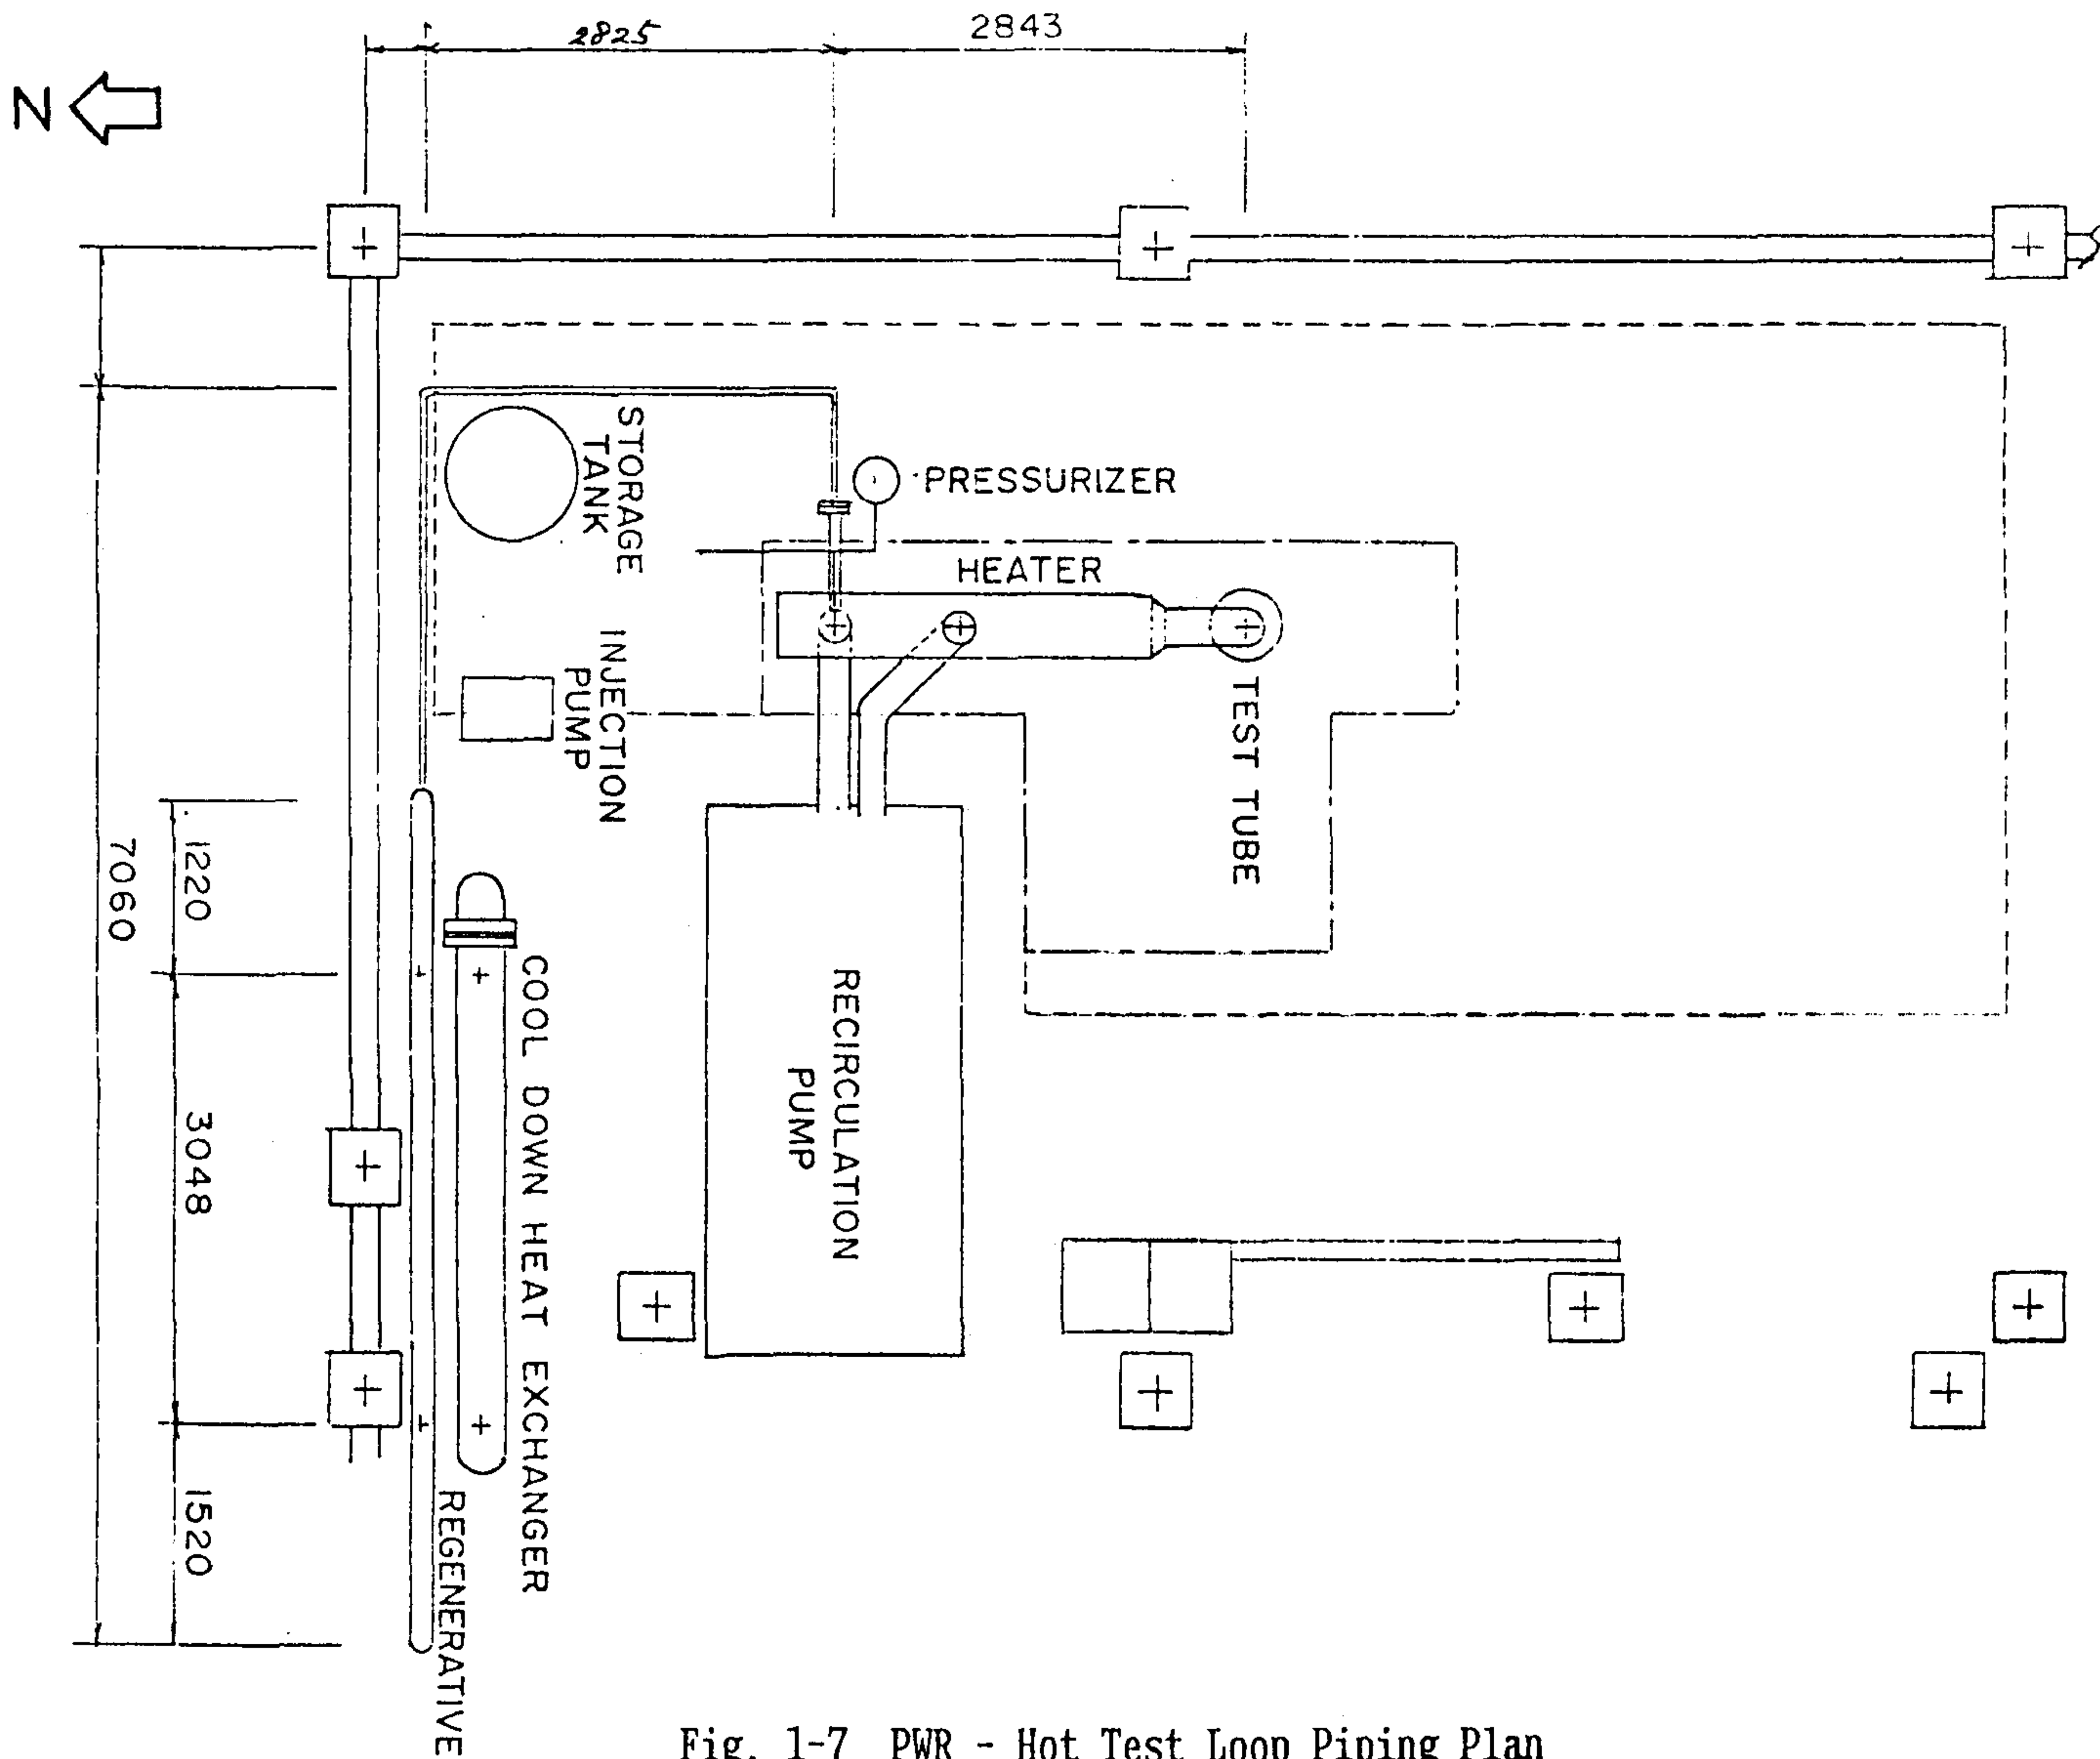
PWR - Hot Test Loop Piping Plan
